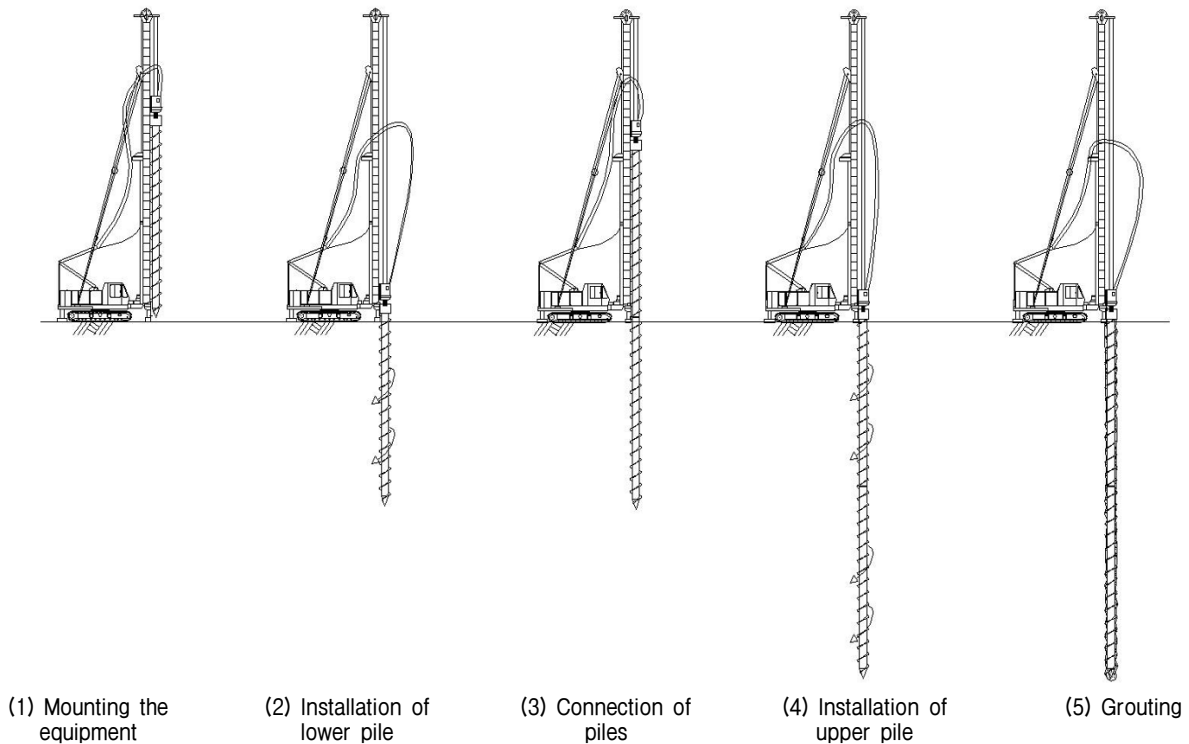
The installation procedures of a screw concrete pile (Choi etc., 2009)
